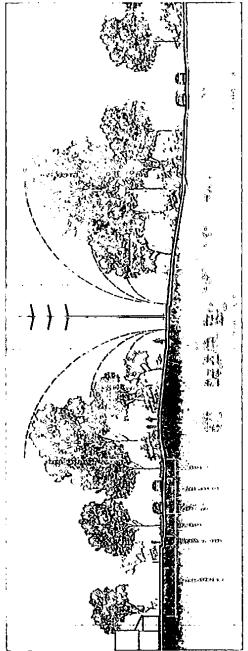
Typical Old Cooma Road Easement Section - Looking South
